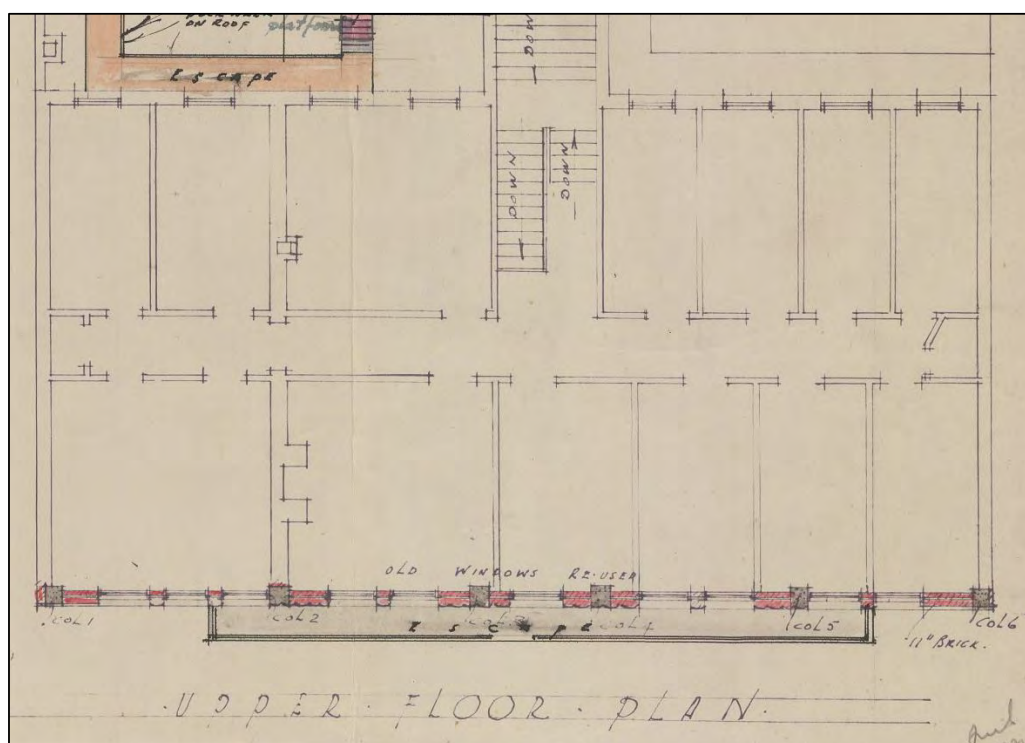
Plan of first floor showing planned alterations to south wall cropped from the 1949 plans for Alterations to Criterion Hotel, Don Street, Invercargill for G. F. Pollock by A. G. A. Milne, architect (ICC Property File).
